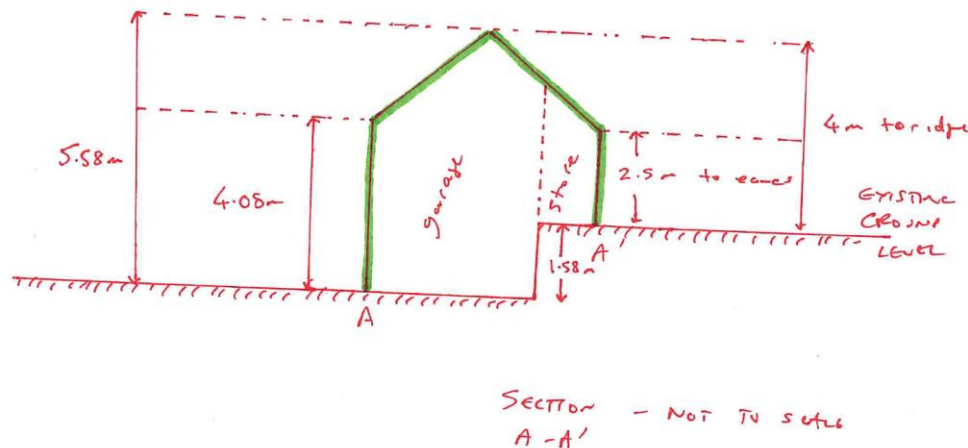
North to south cross section of Permitted Development fall back built onto the hill to the north
